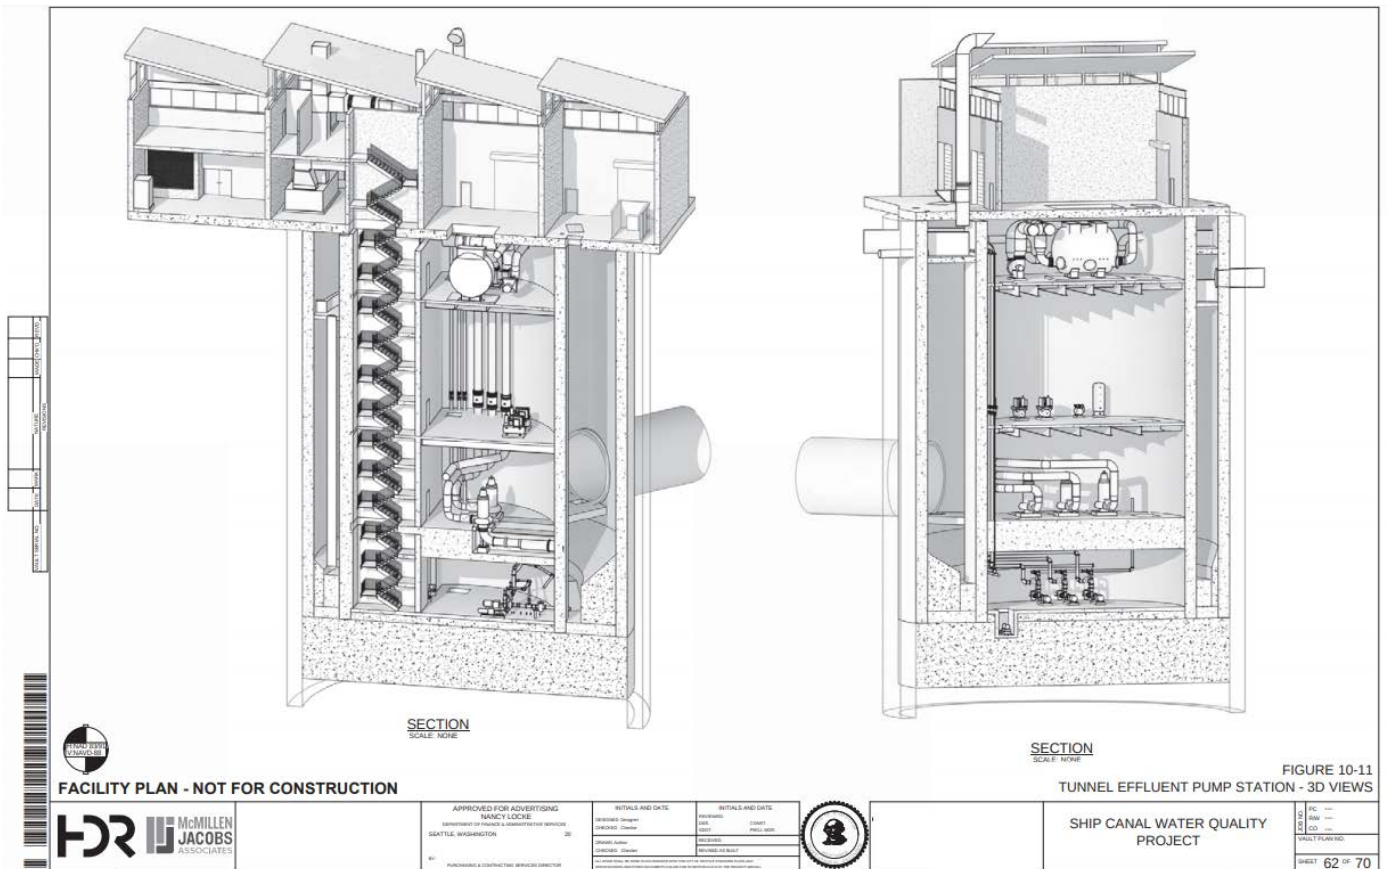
Plans for a Tunnel Effluent Pump Station (TEPS), which will pump the tunnel’s water to the Ballard Siphon
